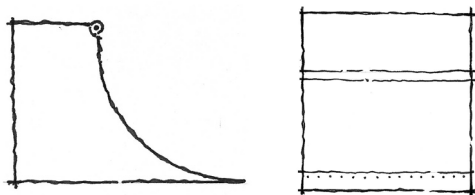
A quarter pipe in elevation, and a quarter pipe in plan.
